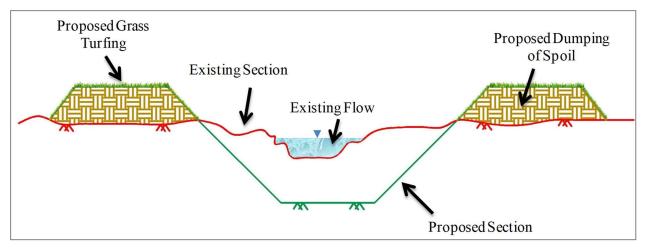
Conceptual Cross Section of a typical khal to be re-excavated
